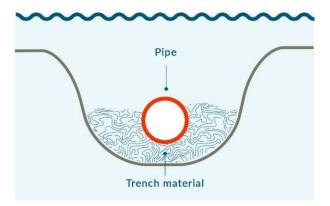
Principle sketch showing the cross section of a trenched pipeline (not to scale).
